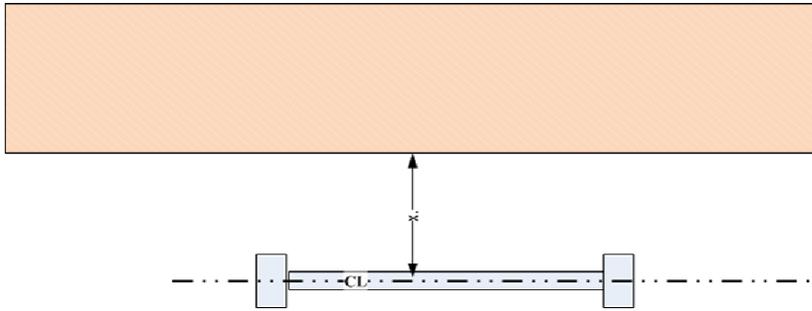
Rail Ladder With Bar Steel Rails and Round Steel Rungs
